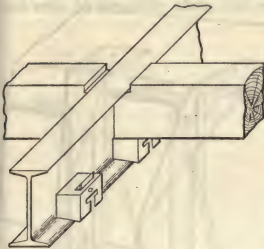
Duplex I-beam Box Hanger. Joists Raised More than Four Inches
